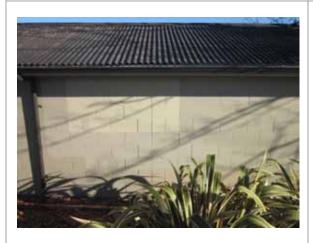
Elevation on the junction between the western most extension and the adjacent structure
